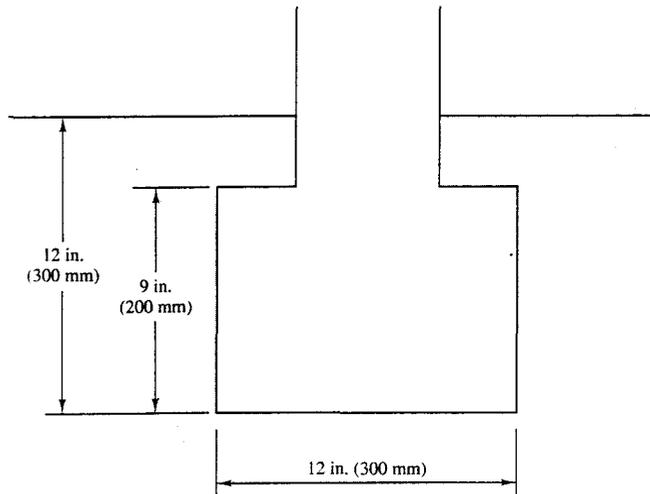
Minimum dimensions for spread footings. If the footing is reinforced, the thickness should be at least 12 in (3000 mm).
